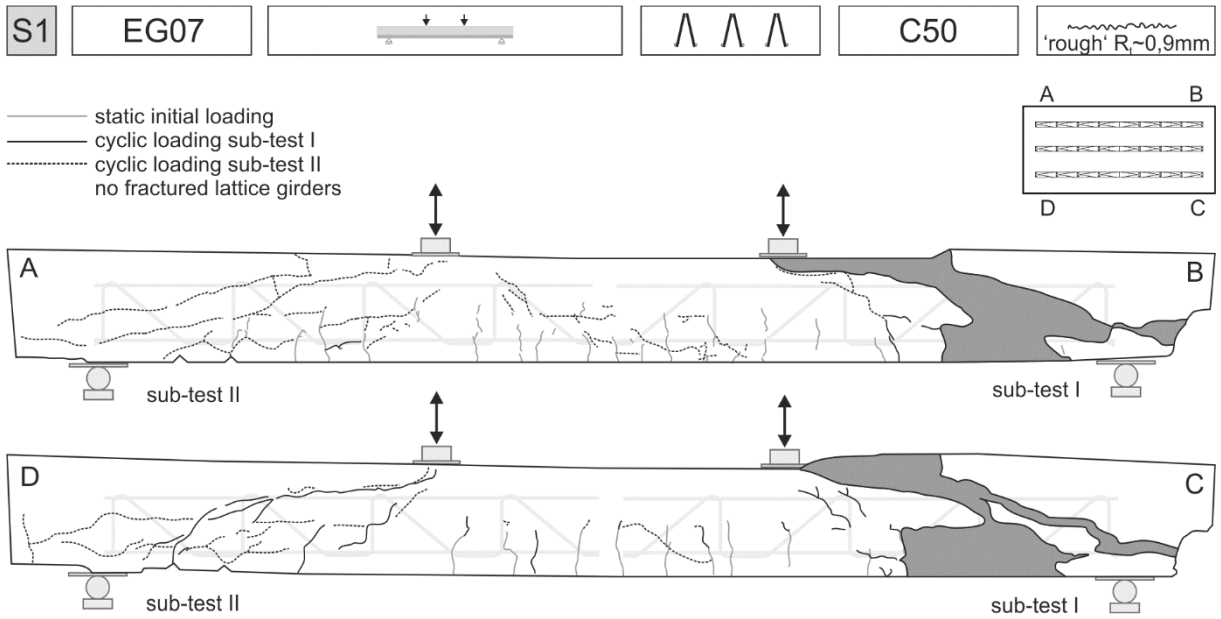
Test parameters, crack patterns and lattice girder fractures of specimen EG07
